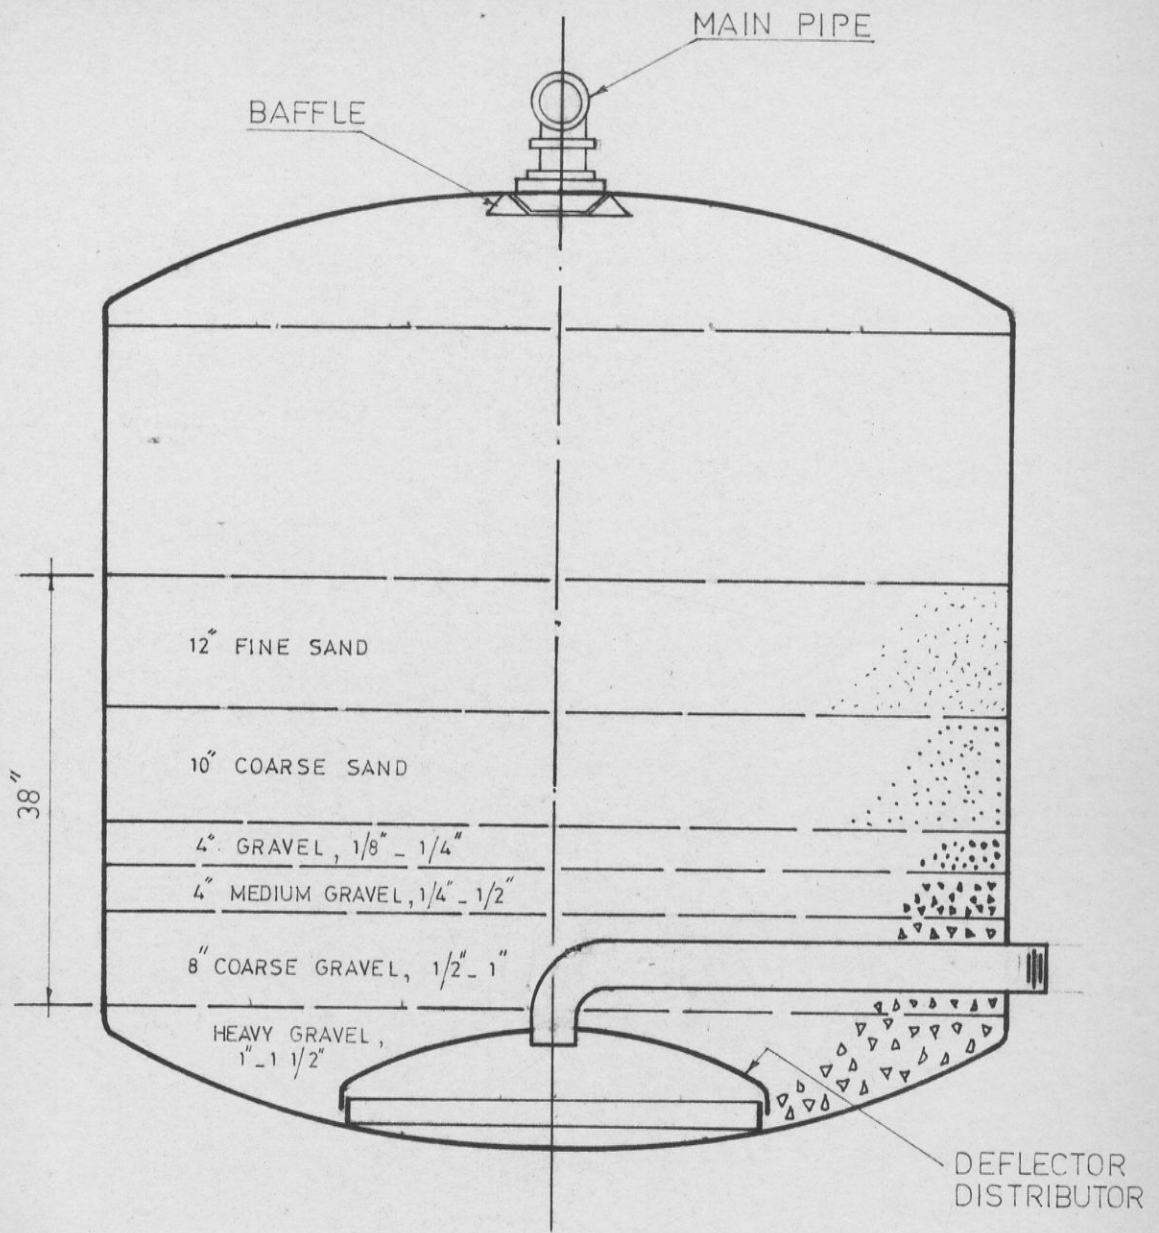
TYPICAL SECTION THROUGH PRESSURE SAND FILTER
